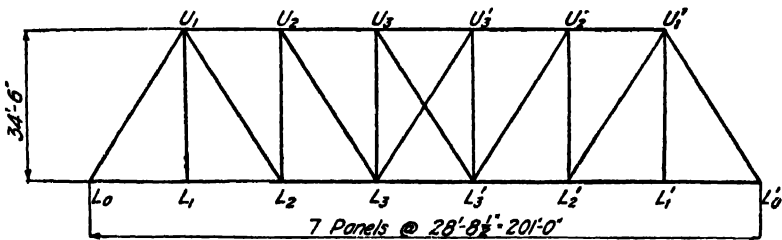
Truss Diagram of a 201-foot, Single-track-railway, Through, Riveted, Pratt-truss Span.
